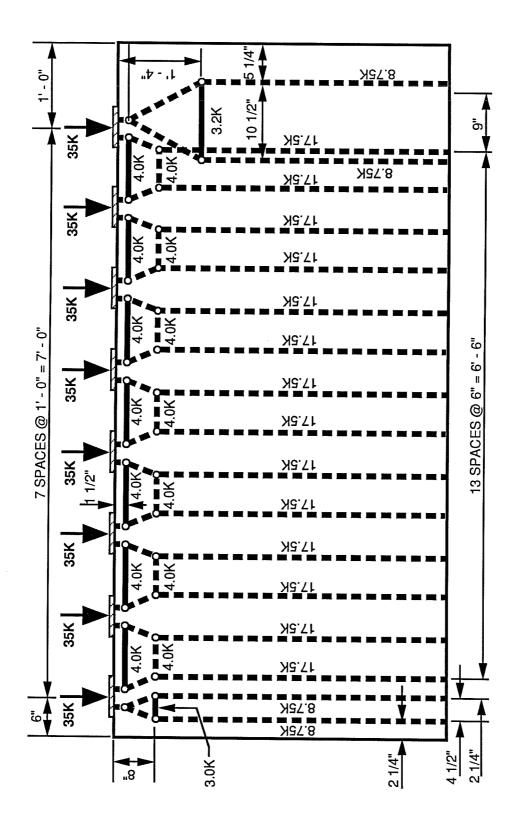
Horizontal Plane Strut-and-Tie Model for Loads on All Anchors
